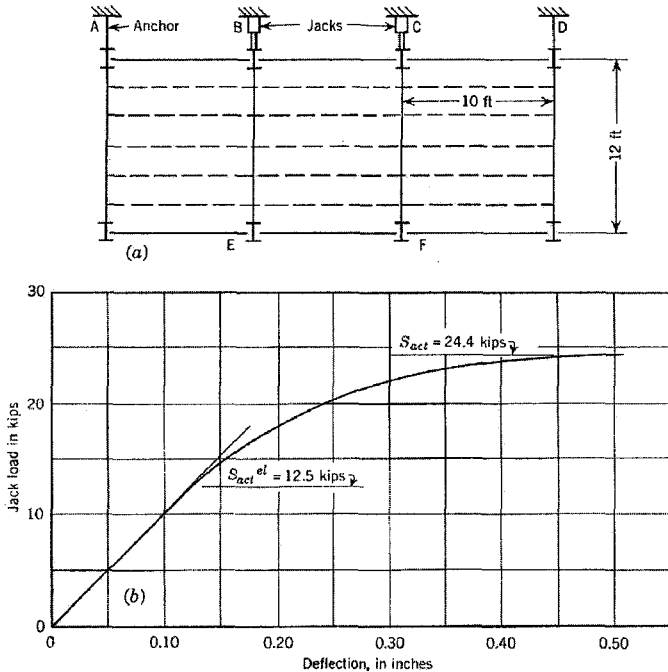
FULL SCALE TEST ON CELLULAR STEEL FLOOR
